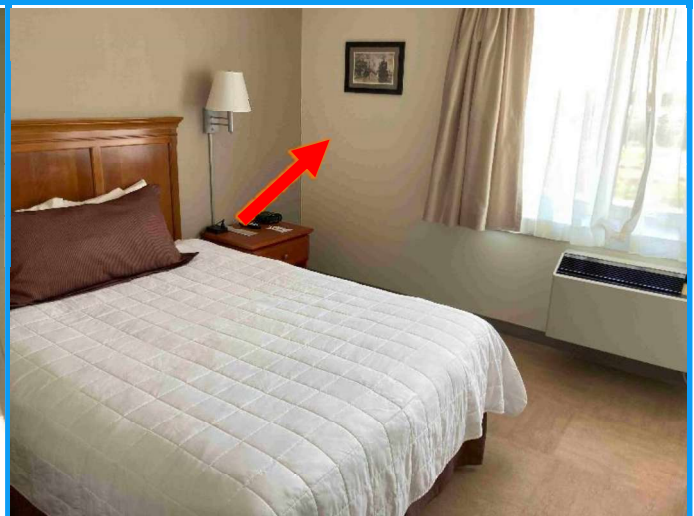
View of a portion of a typical motel room with non-asbestos drywall walls (see arrow) and carpet.
